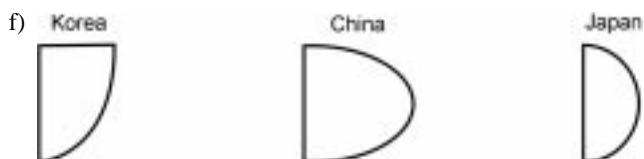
Cross-section of upper hanging rod in Korea, China, and Japan.
